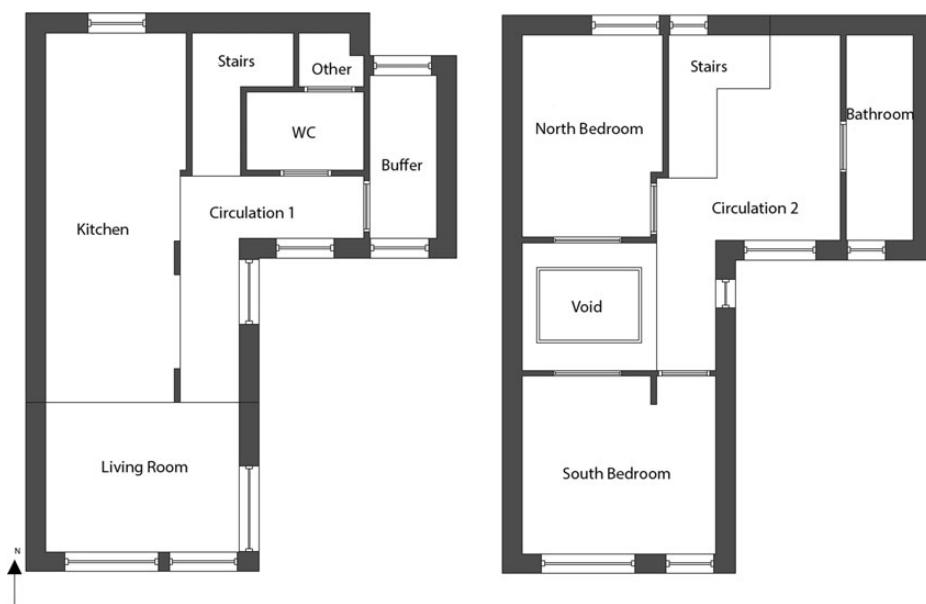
Ground floor (left) and first floor (right) plans and zones. Model created in EDSL Tas.
